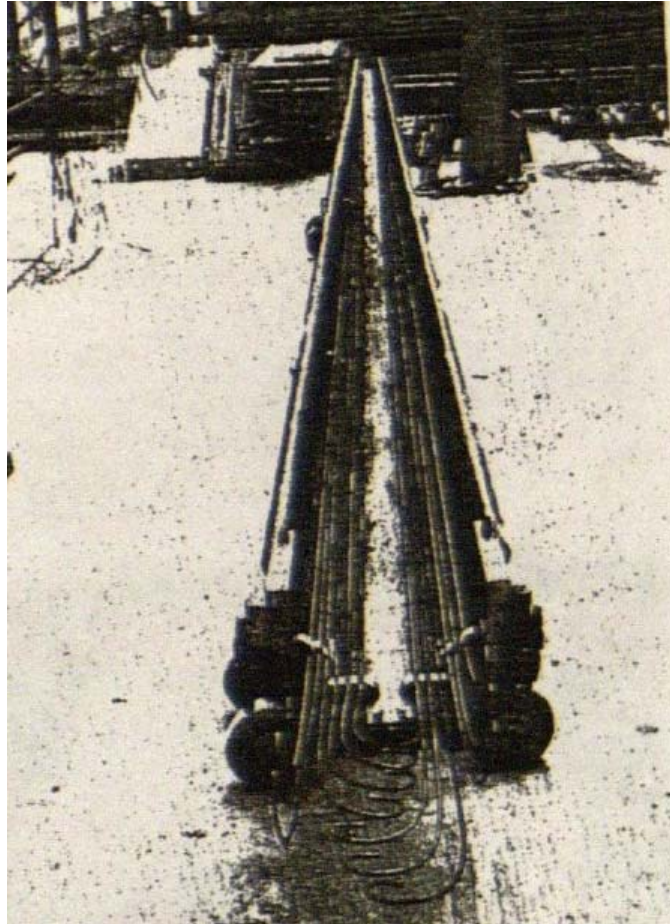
A half-mold containing steel reinforcements tensioned for Montarig poles
